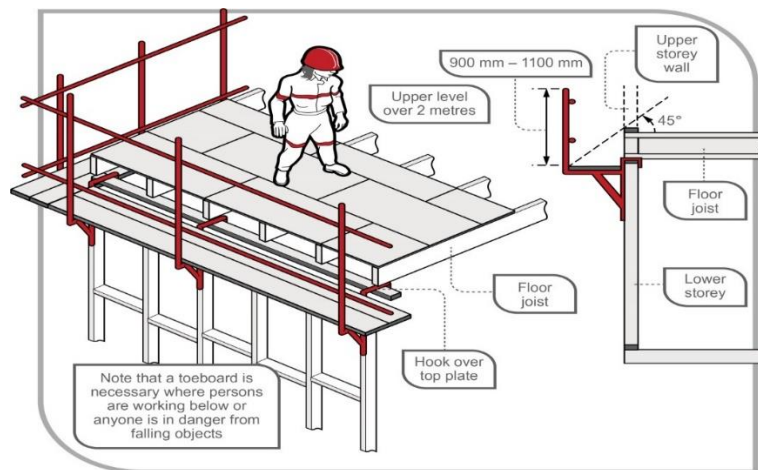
EXAMPLES OF UPPER FLOOR EDGE PROTECTION (EXTERNAL SCAFFOLDING)
